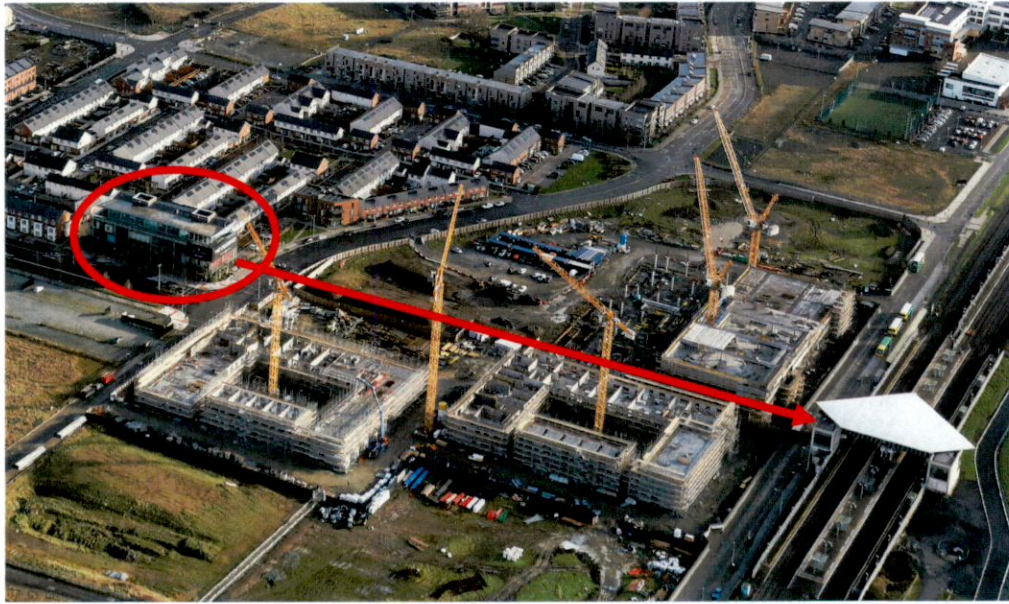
Subject site at No. 1 Adamstown Boulevard (circled in red), with short walk through Adamstown District Centre to Adamstown Rail Station shown by red arrow
